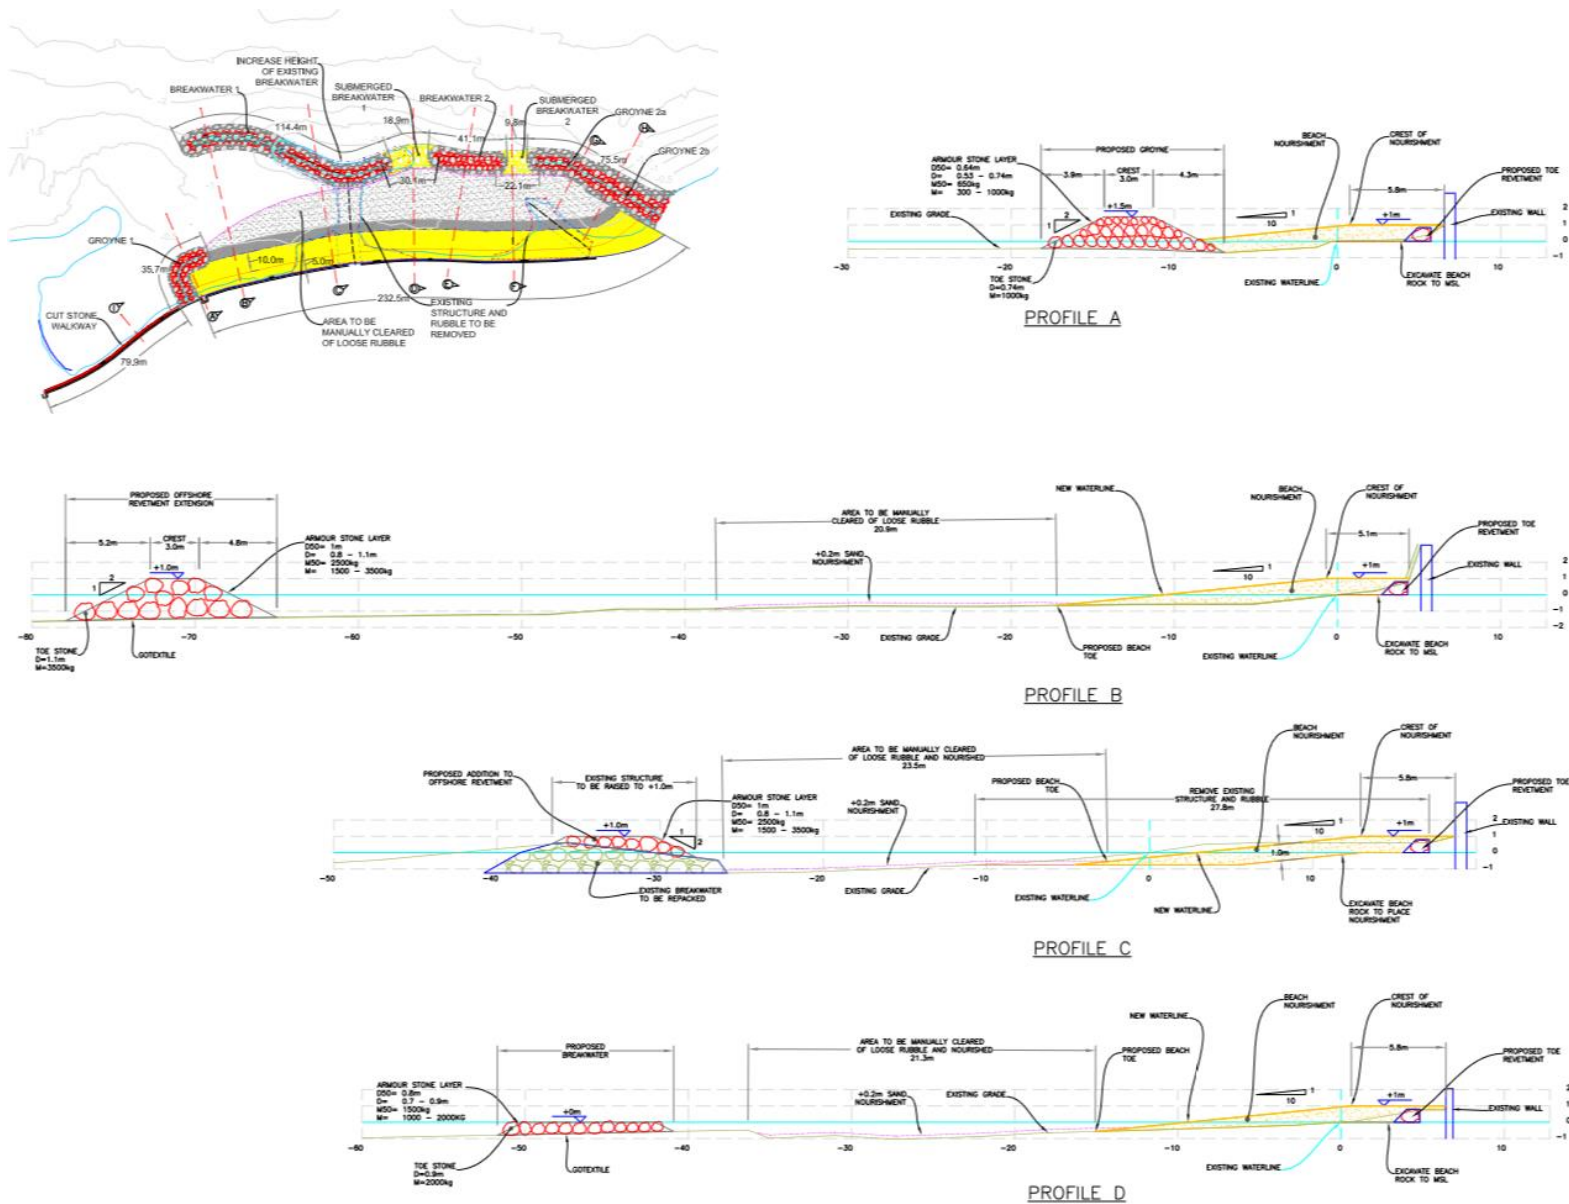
Cross-sections of the proposed breakwater system and beach nourishment; plan of proposed structures shown in left window
